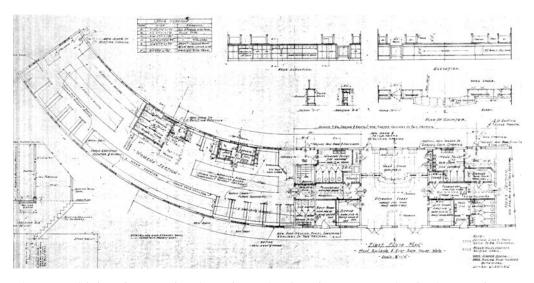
Partial Floor Plan, central portion and east wing, from the 1949 renovation drawing set. The current interior layouts of the wings are primarily as shown on this drawing
